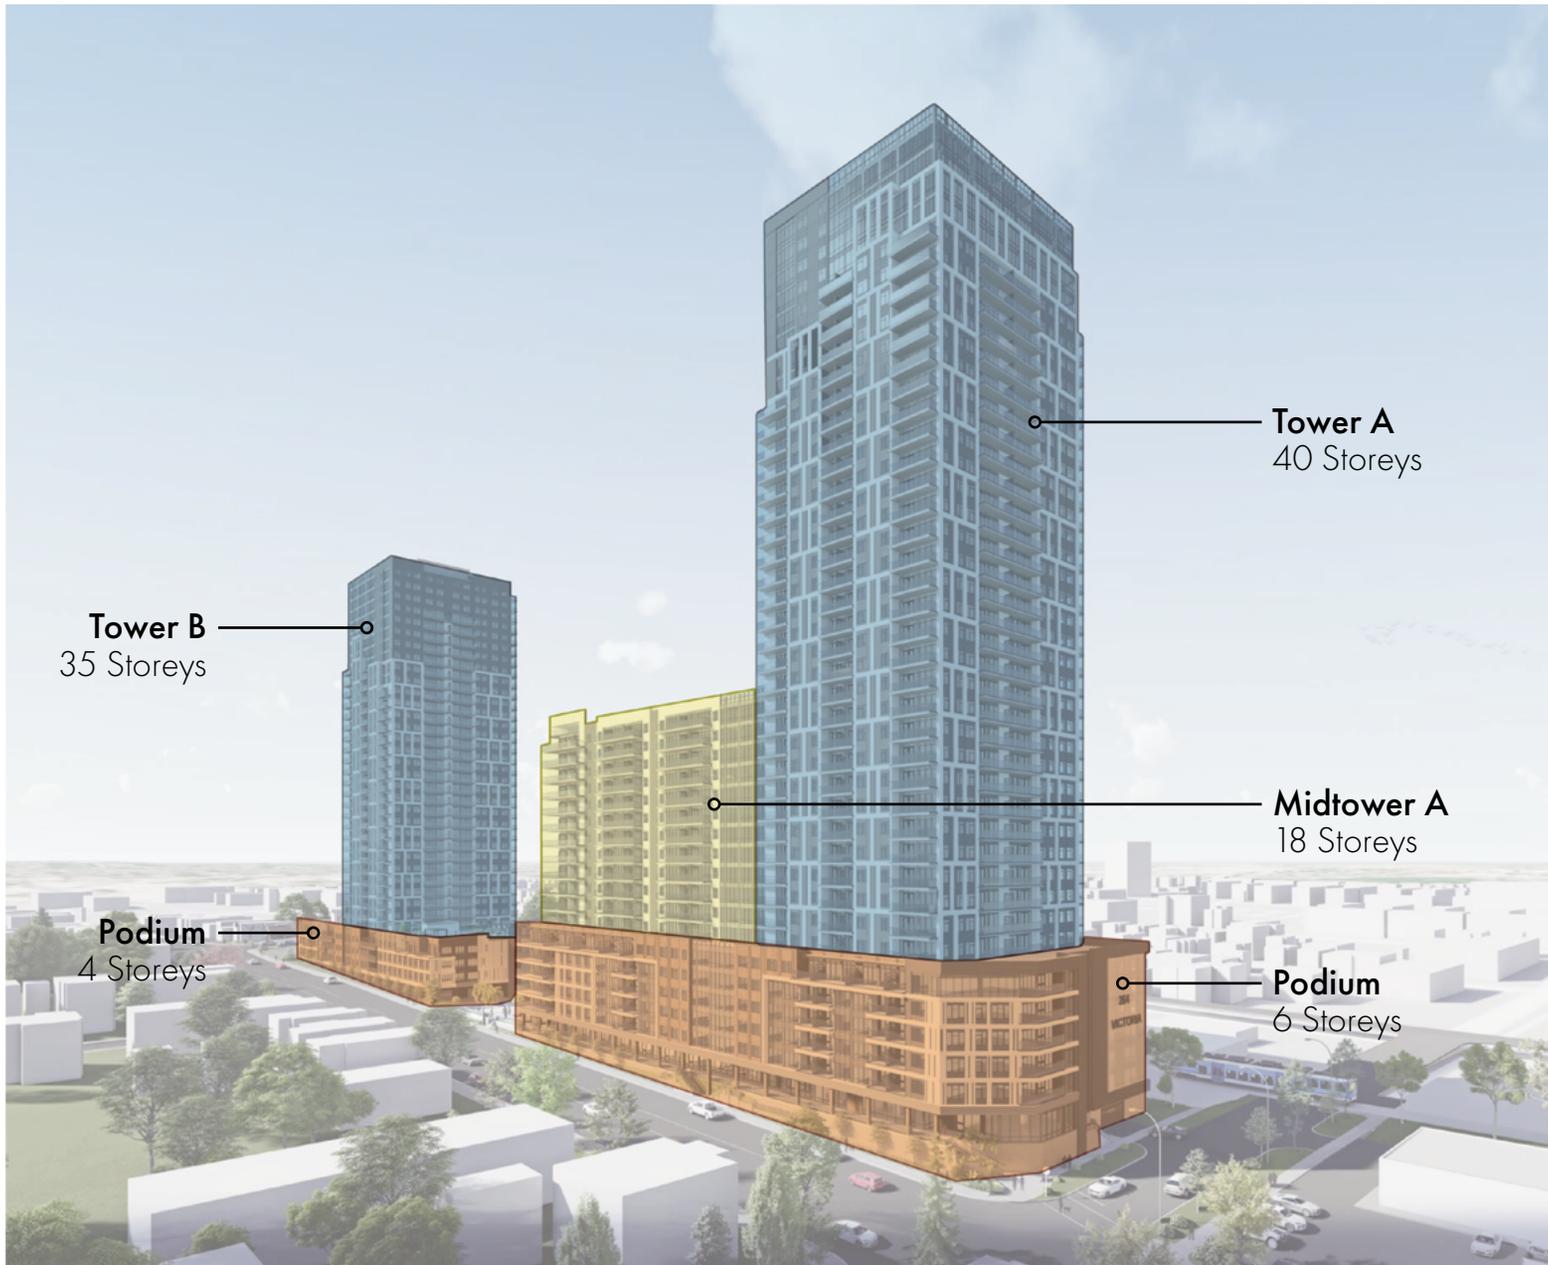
Proposed massing, with podium, tower, and midtower forms
